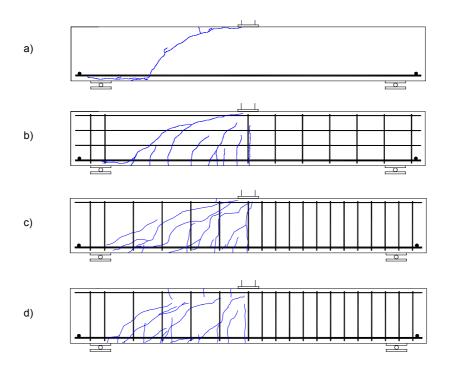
Typical crack patterns at failure in the tested beams. a) Beam specimen without web reinforcement. b) Beam specimen with longitudinal reinforcement distributed along the web. c)Beam specimen with stirrups. d) Beam specimen H60/3 – shear cracks did not reach the load application zone.
